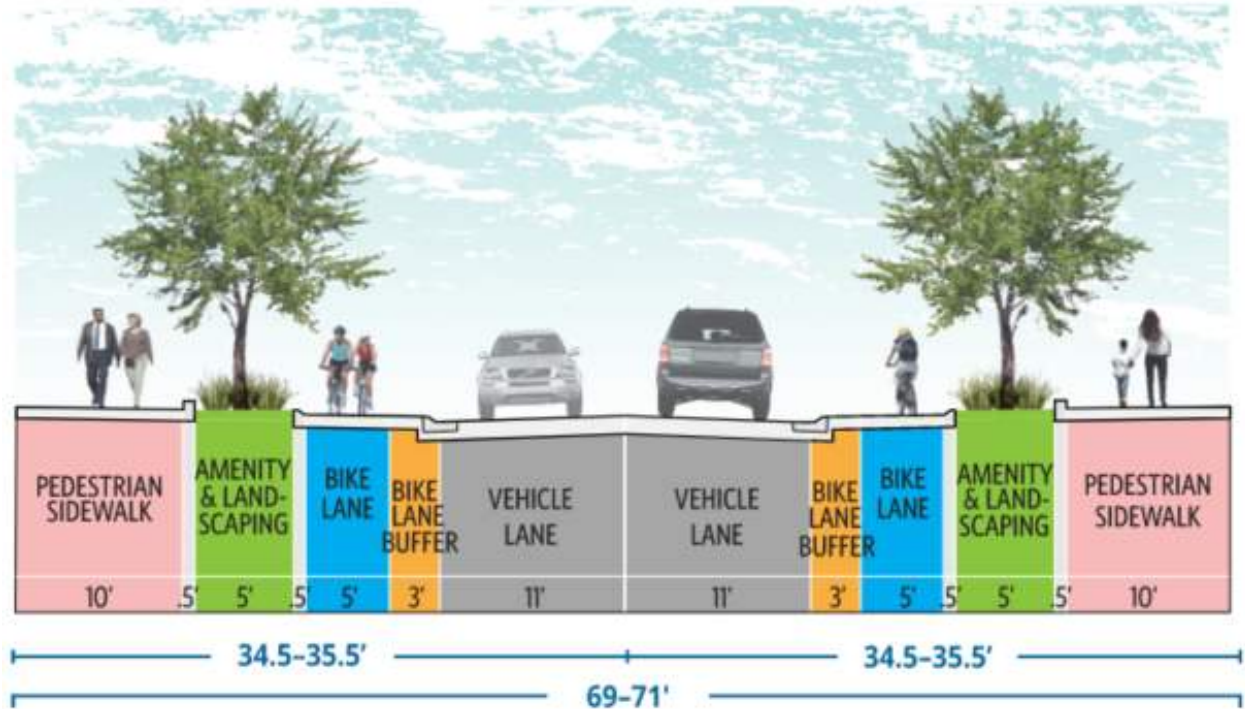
Bike Lane Adjacent to Road, Separated Vertically from Sidewalk
